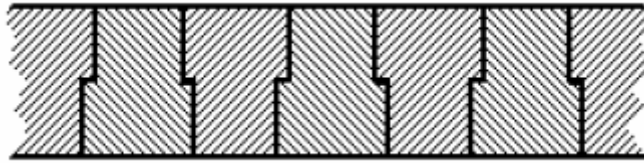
Longitudinal Elevation View of the Roof Blocks
